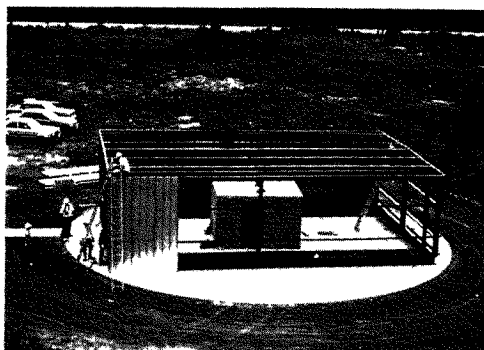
The TTU Test Building under construction in Lubbock, Texas (1987). The fixed, internal blockwork room is where the data collection instrumentation are housed.
